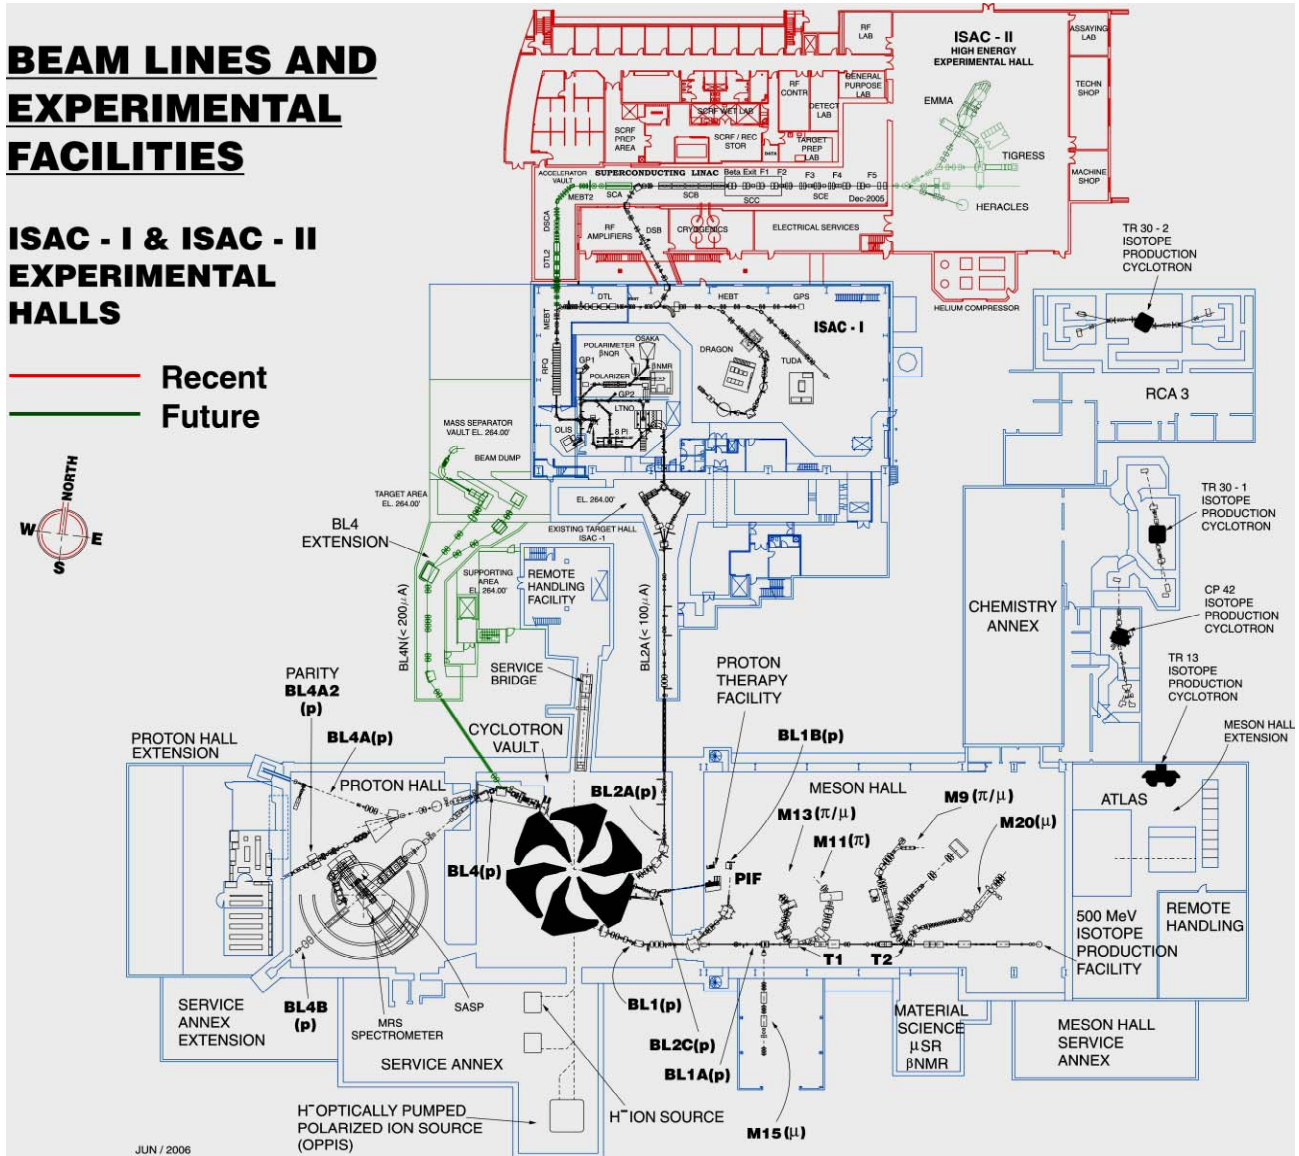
A schematic layout of the TRIUMF facility. The red lines indicate the building envelop for the ISAC II civil construction. The green lines labeled as BL4 extension, indicate the proposed building envelop for the proposed new high power target test facility. The ISAC II high beta cryomodules have been omitted in the schematic. Instead the HEBT beamline to the experimental hall is shown after completion of medium beta cryomodule installation in 2006. The proposed electron linac for photo fission would be located in the location of the MRS spectrometer in the proton hall.
